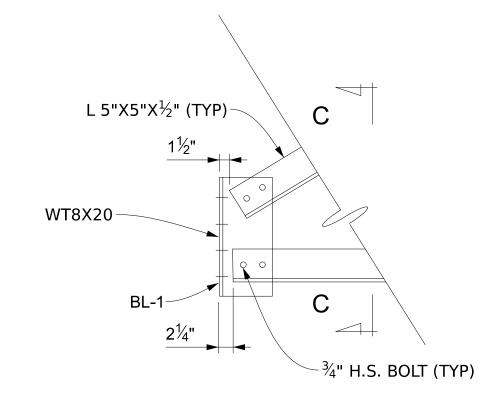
DETAIL D BRACING ANGLES NOT SHOWN FOR CLARITY
